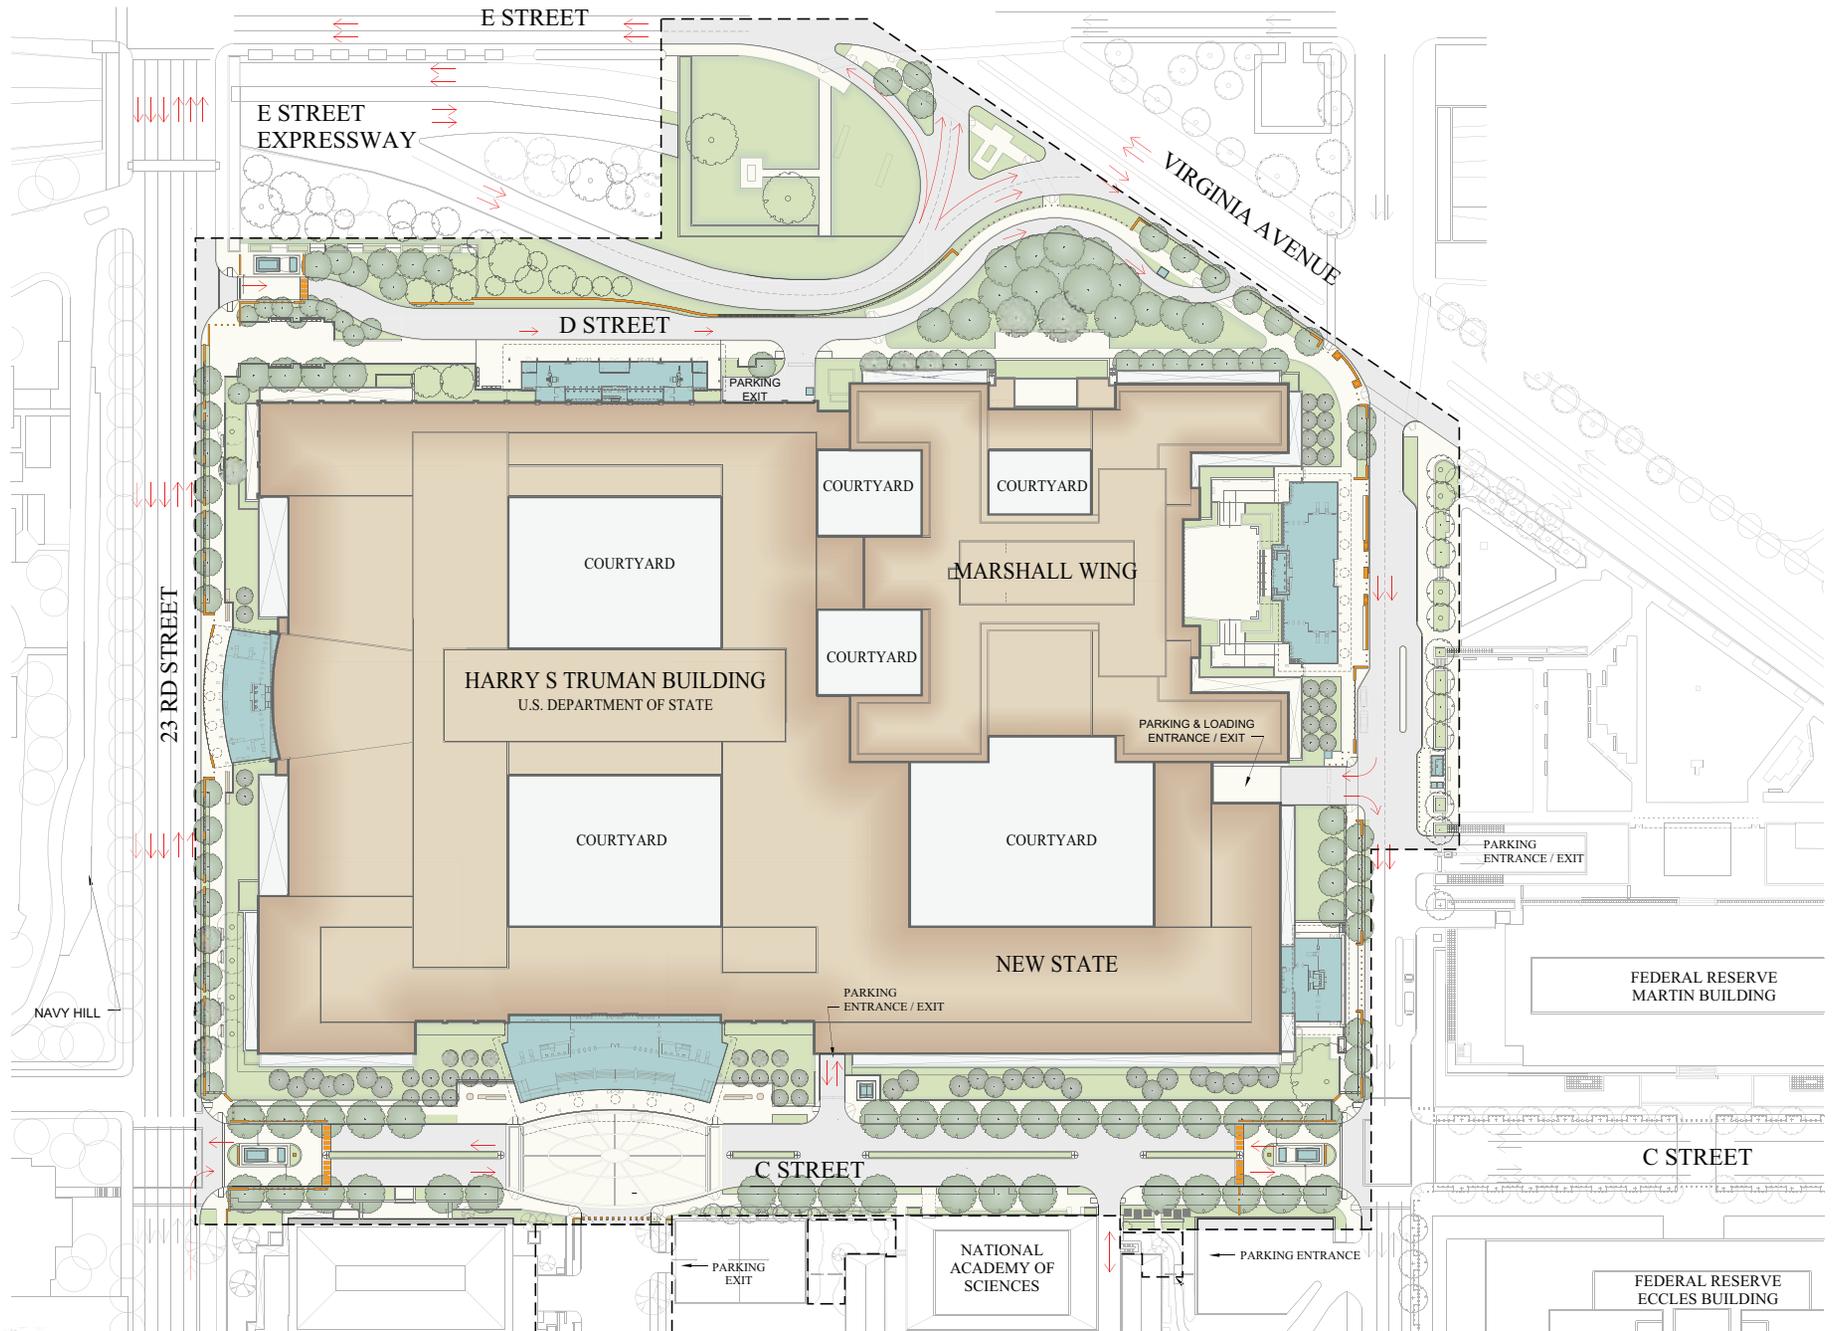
2004 Concept Plan for the Harry S Truman Building Perimeter Security Improvements Project
